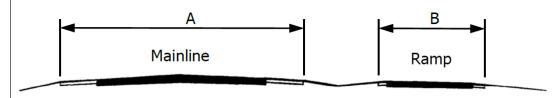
Approach roadway cross-section view for a mainline and a ramp that are carried across one bridge.
